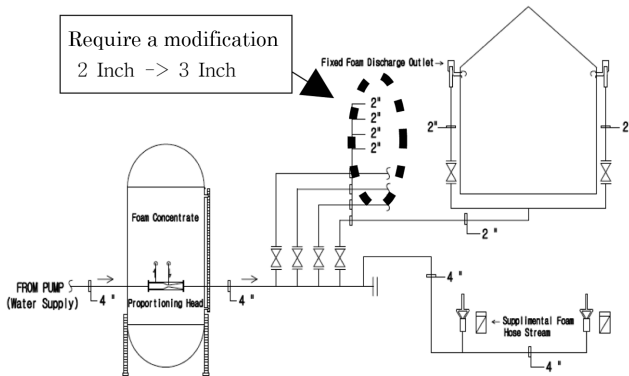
Redesign drawing for an outdoor benzene storage tank foam fire-extinguishing system already installed.
